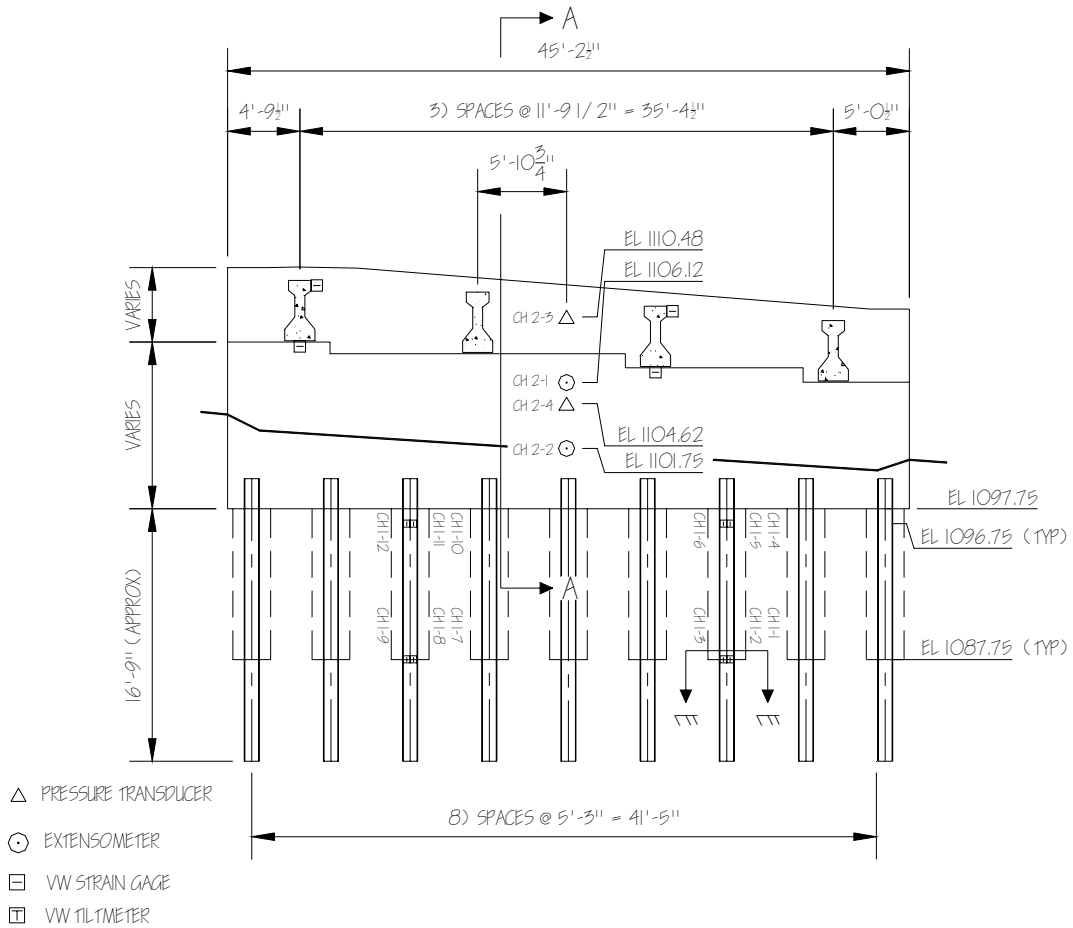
Structure 222 Abutment 2 Elevation (Section B-B)
